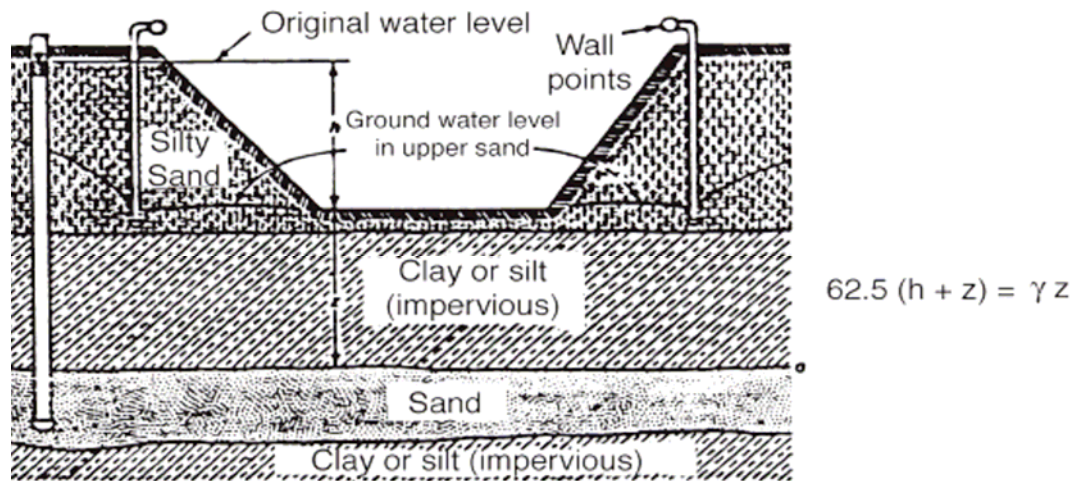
Bottom of excavation stability problems due to excess hydrostatic head against an impervious layer
